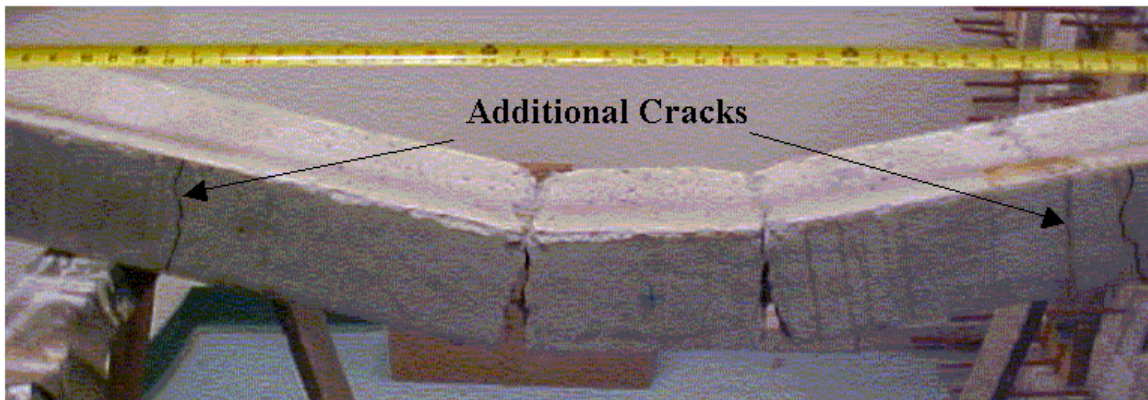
About half of the under-reinforced beam specimens exhibited cracks originating on the top of the specimen, and located halfway between the impactor points and ends of the beam.
